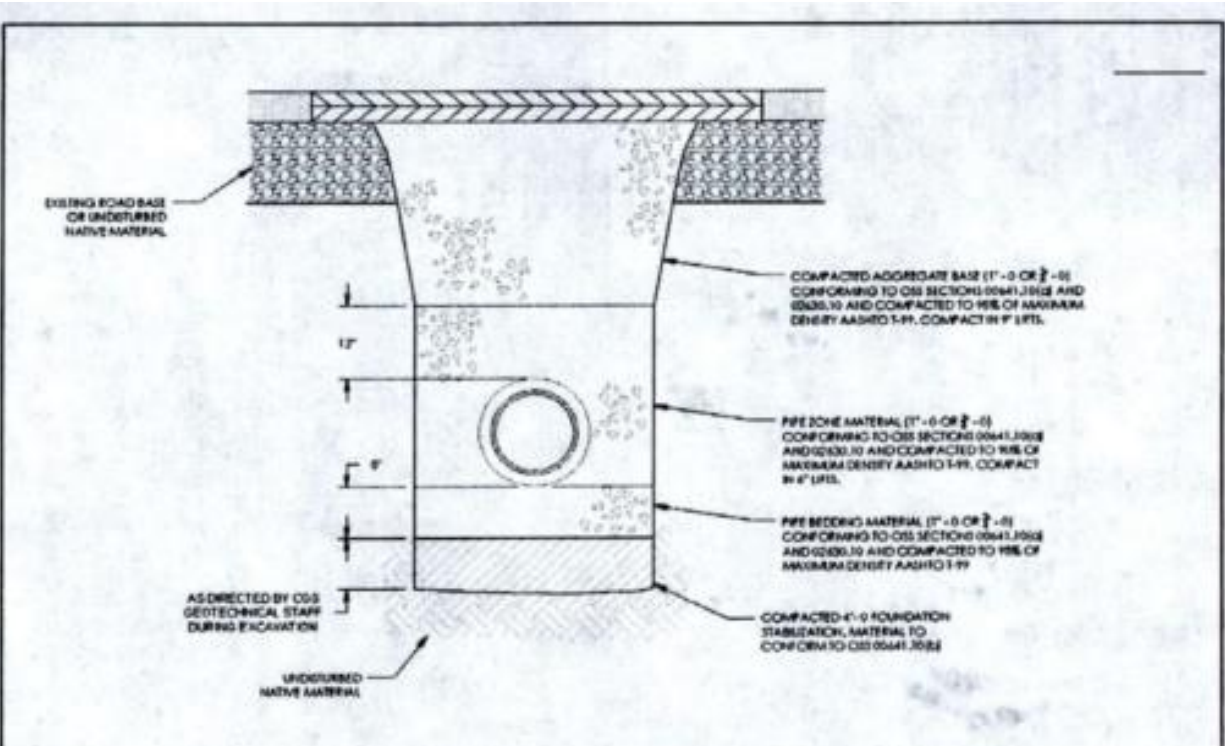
Figure B – Trench in ROW, Under Structure or Pavement, Etc.
